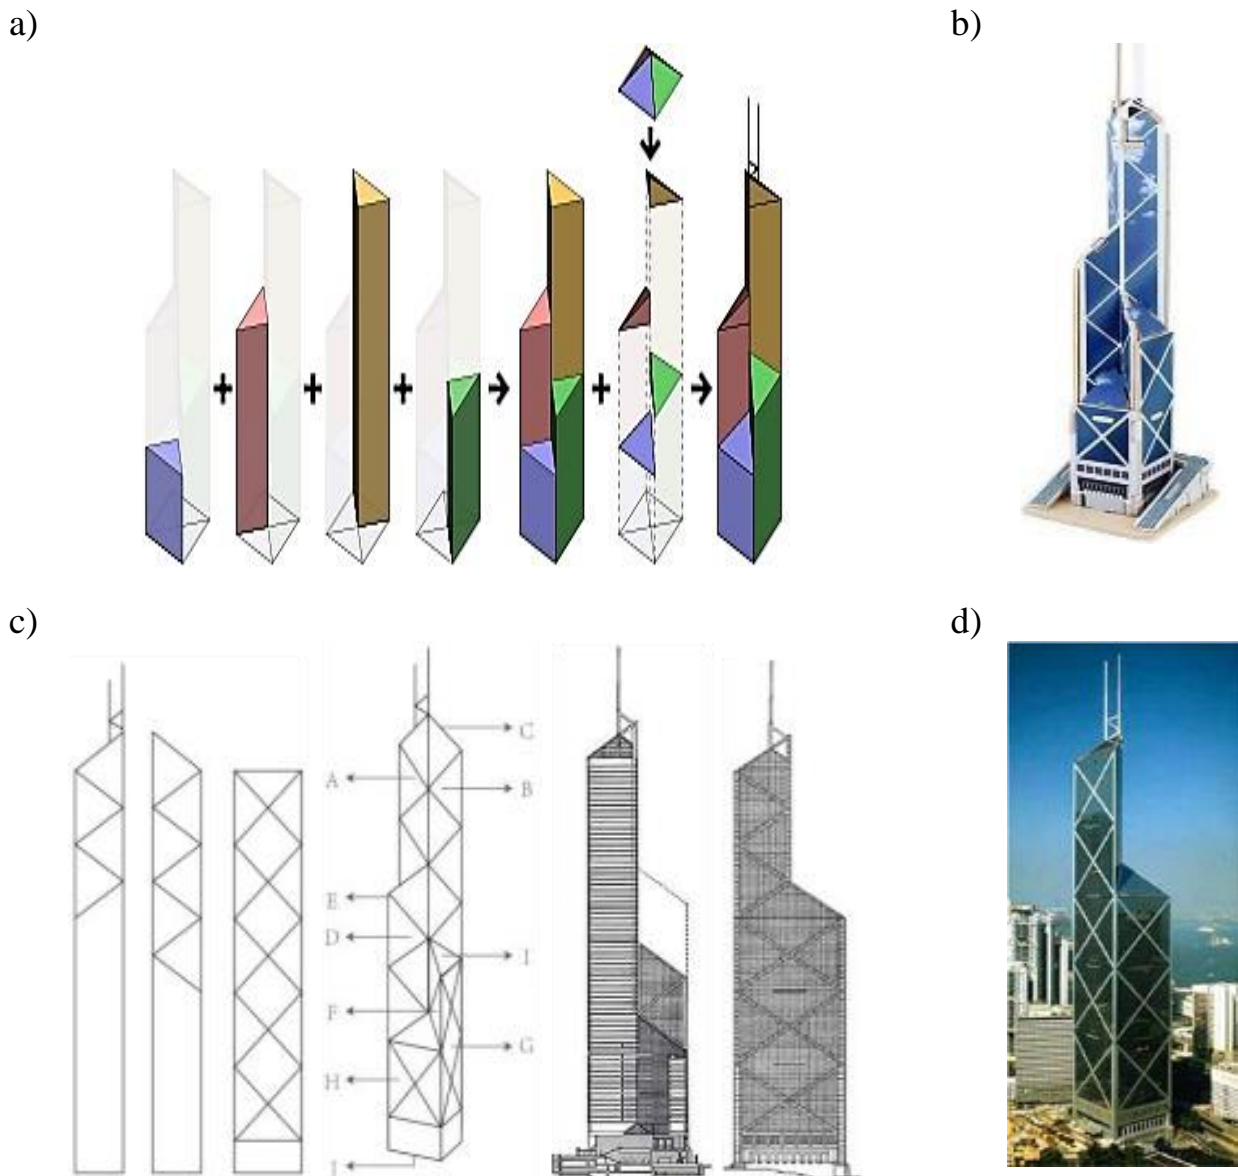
Creating a three-dimensional form of the “Bankof China Tower” building in Hong Kong: a – simple geometric shapes; b – volumetric and spatial structure; c – constructive solution; d – general view of the building
